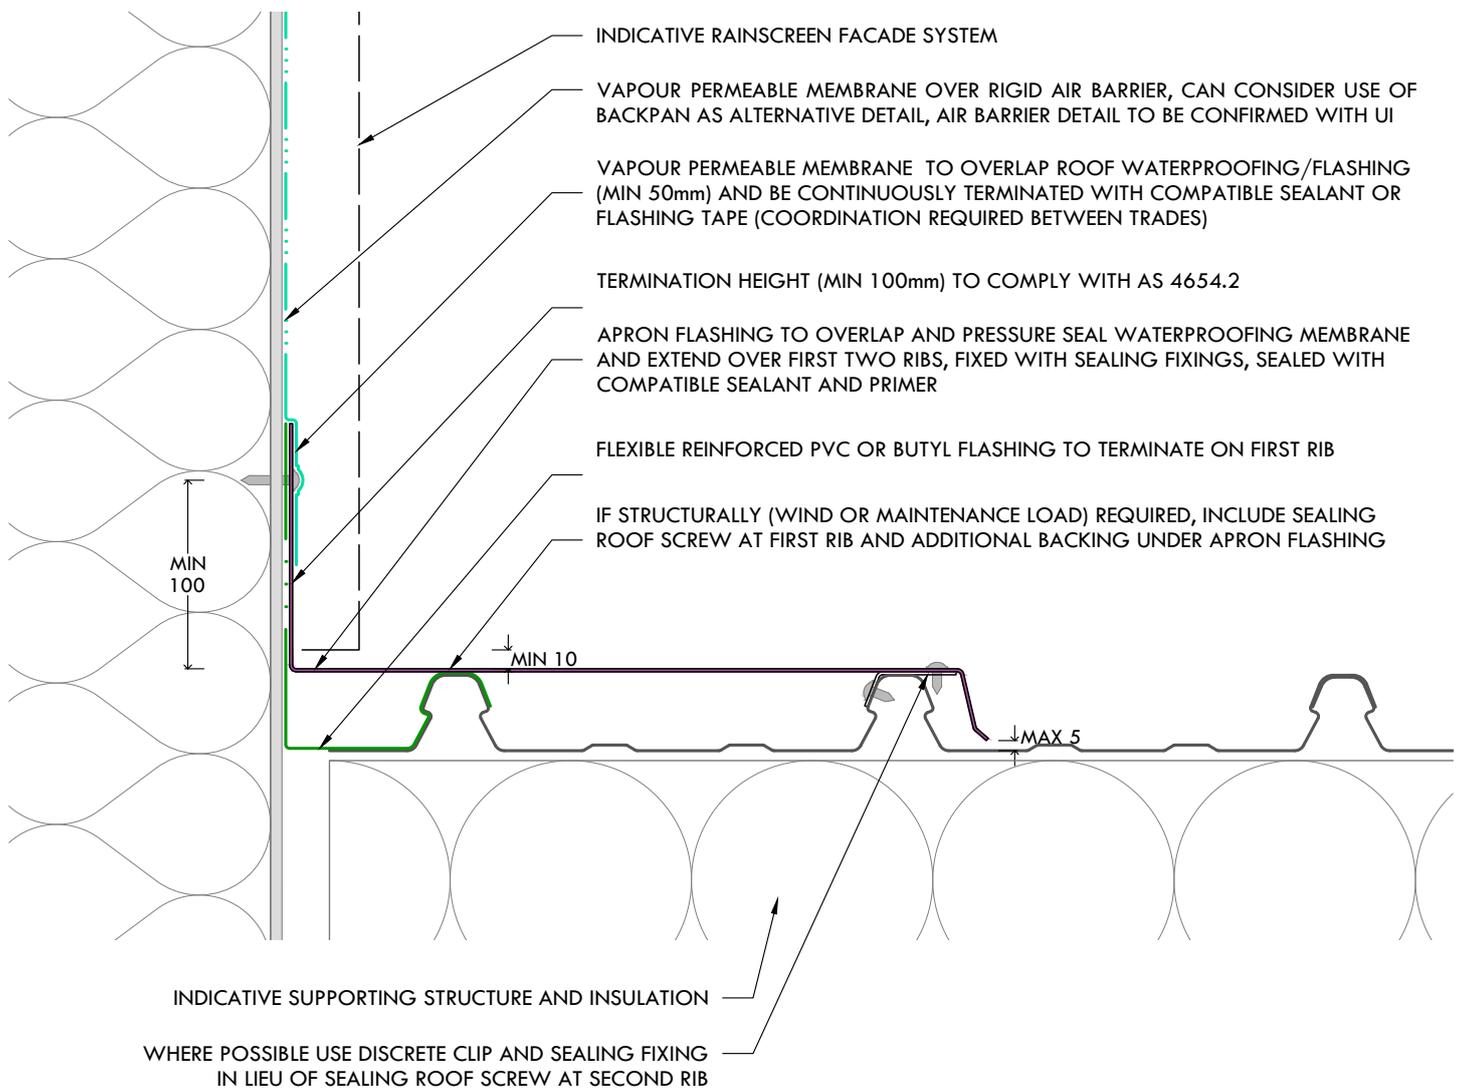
METAL ROOF TERMINATION AT RAINSCREEN FAÇADE
